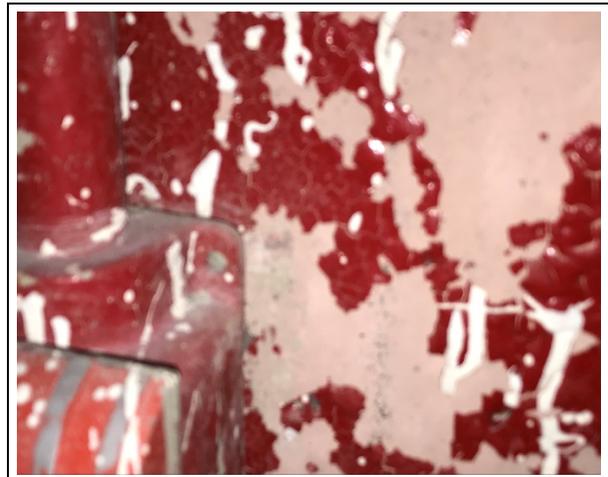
Building 3 – lead-containing (4,800 ppm) red coloured paint located on the interior walls of the storage room
